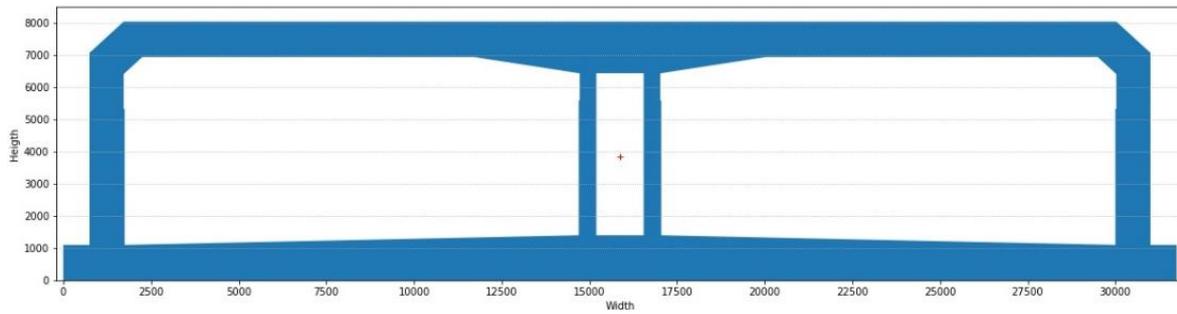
, COMPLETE TUNNEL CROSS SECTION
